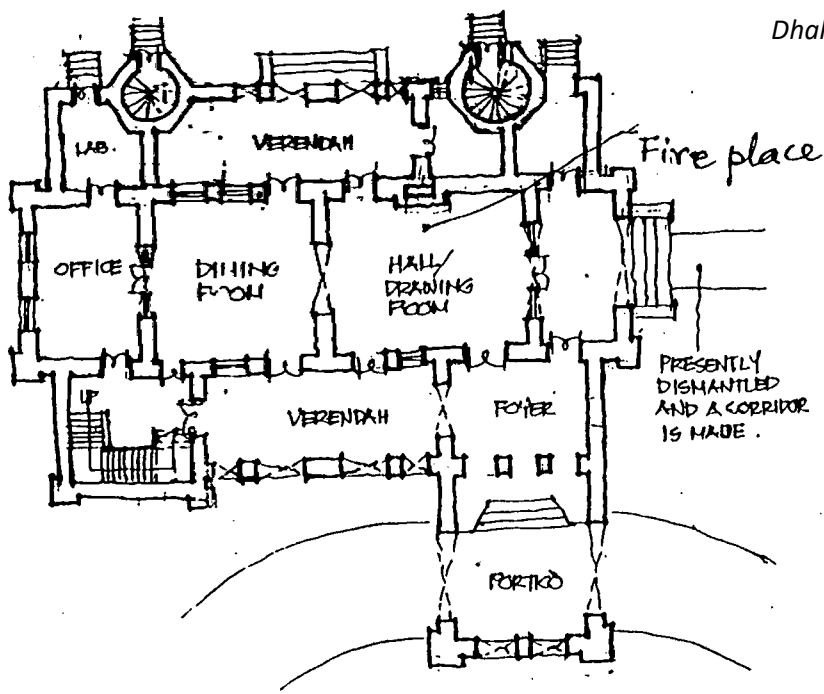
Ground floor plan, D.M. Bungalow, Rajshahi
